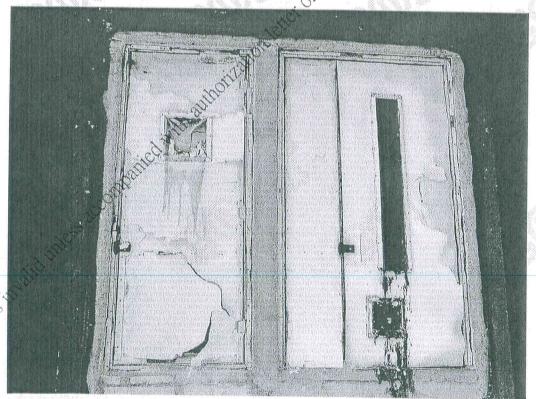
Exposed surface of the specimen after the test. (Left: Door B; Right: Door A)
